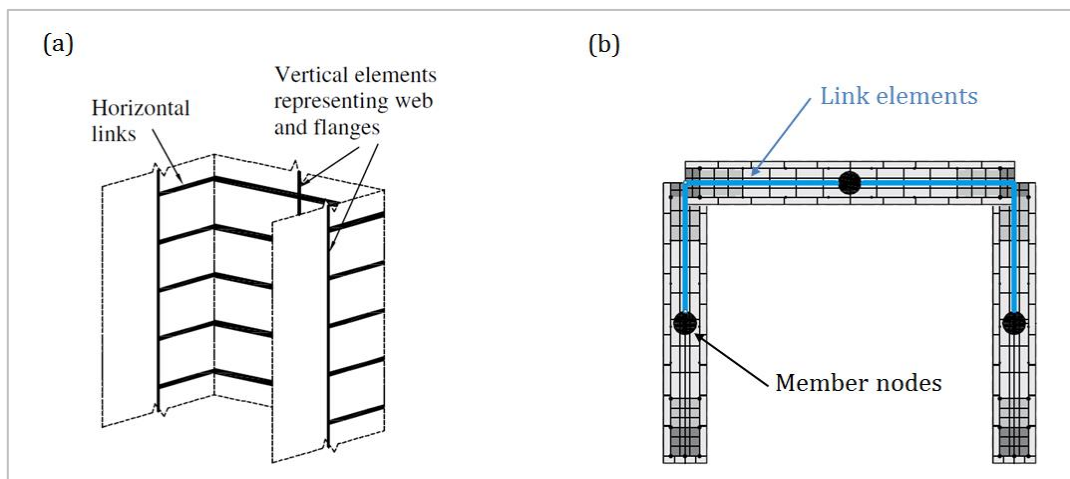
Wide-column model: (a) C-shaped wall member positioning, (b) C-shaped wall cross-section idealisation; two flange members and one web member, adapted from Beyer et al. (2008a)
